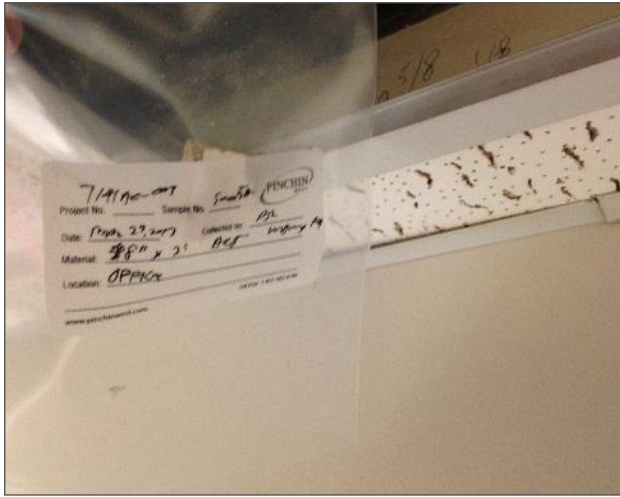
Acoustic Ceiling Tile, 24"x48" Pinhole and Wavy Fissure, (Sample S0005A-C) Office Location (119).
